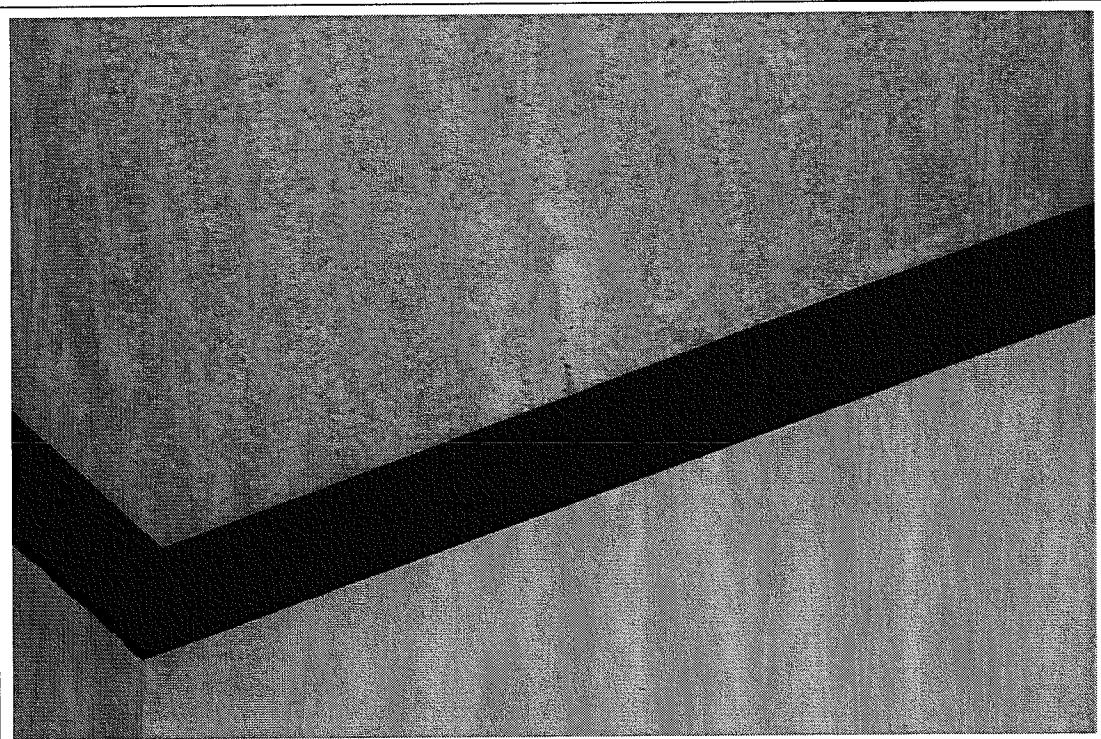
1st floor west office areas - Damaged acoustical plaster in lobby
